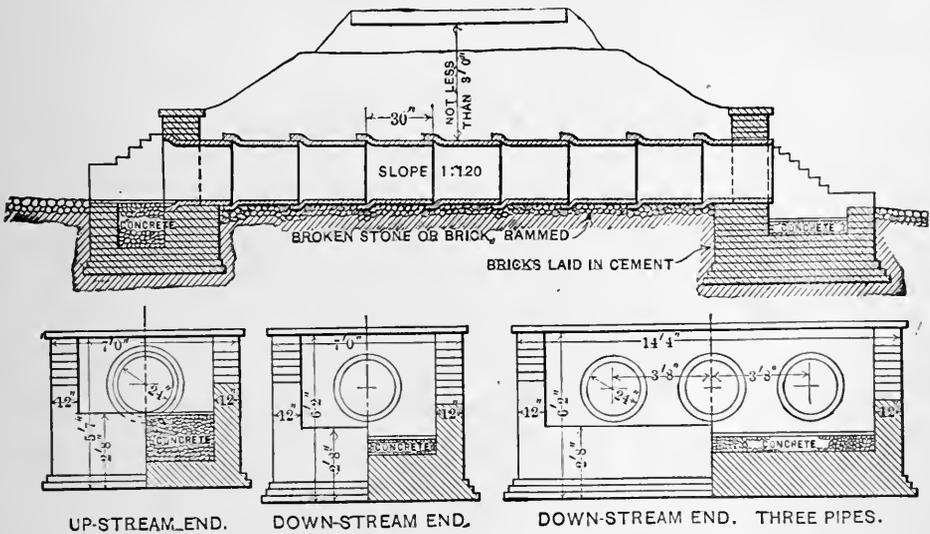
STANDARD VITRIFIED-PIPE CULVERT. PLANT SYSTEM. (1891.)
